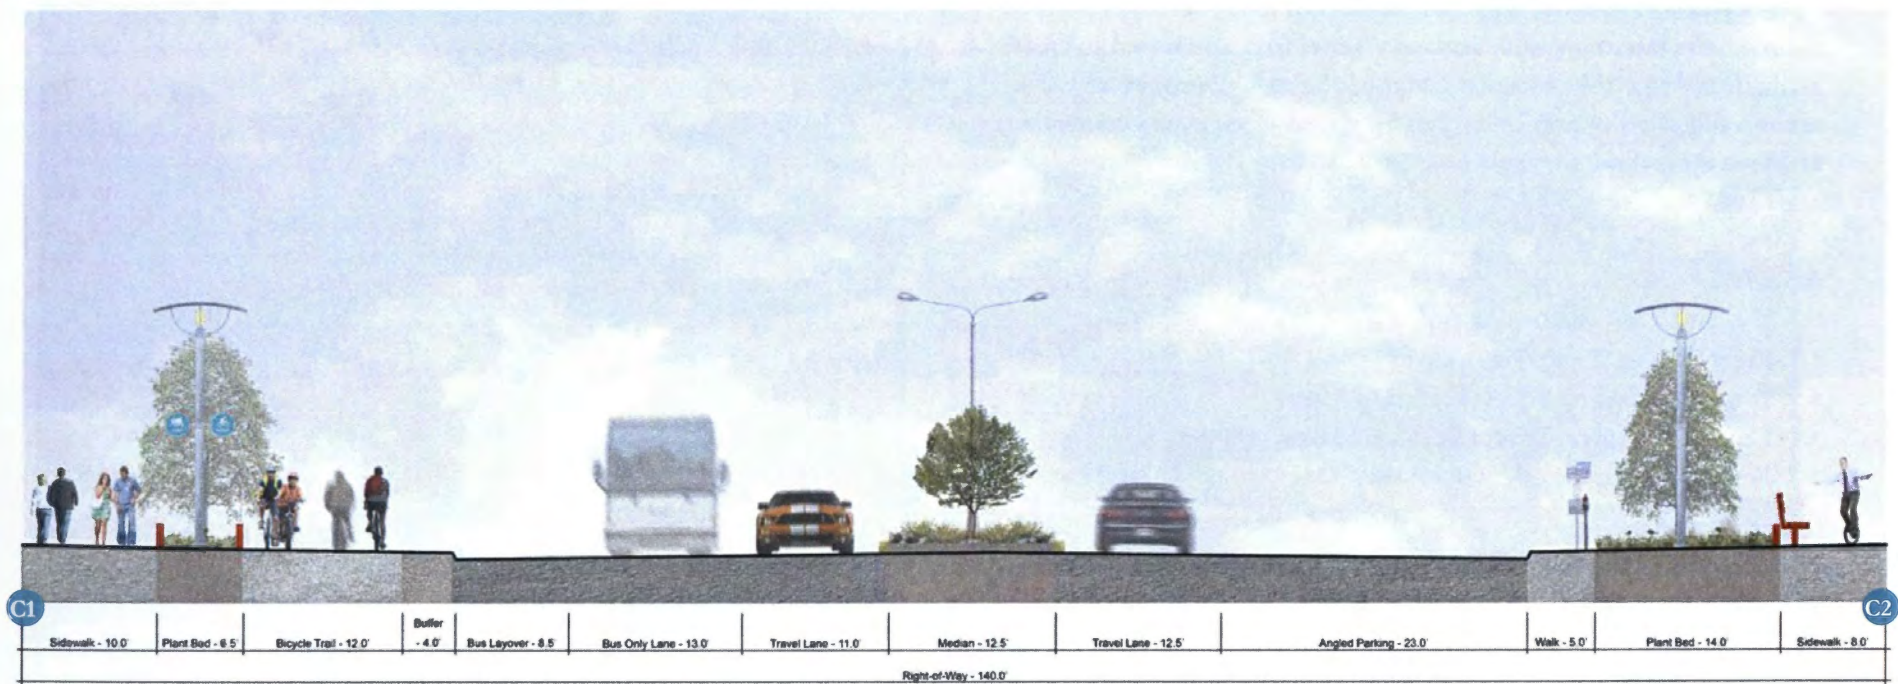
East 12th Street between Rockwell Ave and St. Clair Proposed Section
